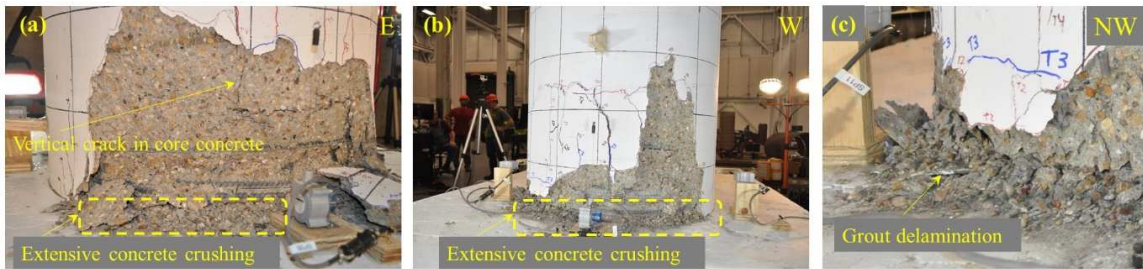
Damage in RC rocking column at 7.39% drift ratio: (a) vertical crack in the core concrete and extensive concrete crushing on east side; (b) extensive concrete crushing on the west side; (c) grout delamination on foundation block surface.
